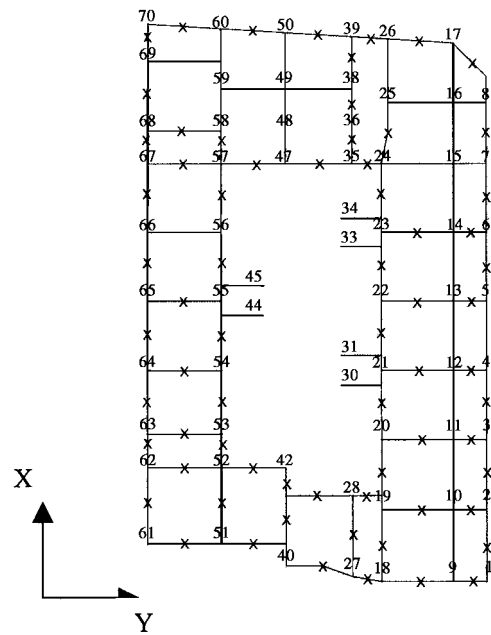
The plane of building with column numbers and wall location (Marked with \times)
